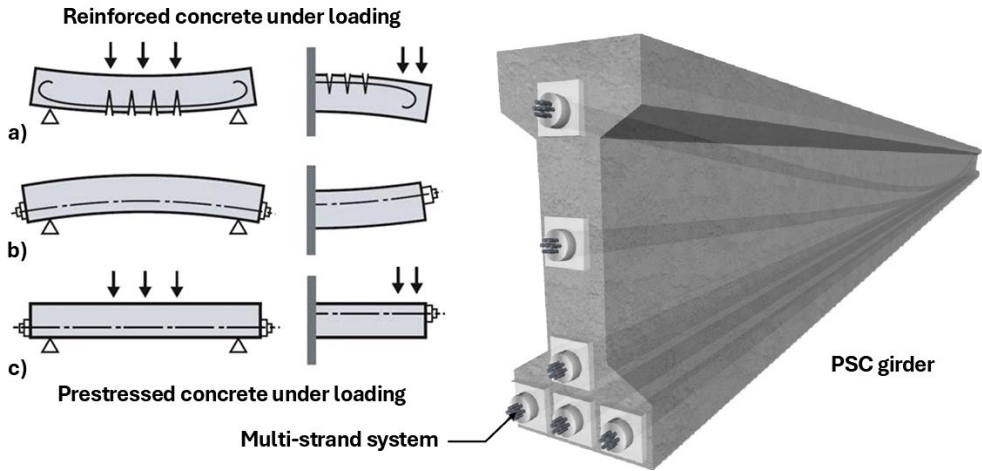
Prestressed concrete (PC) basic principles, a) reinforced concrete cracked under load; b) post-tensioned concrete before loading; c) post-tensioned concrete after loading.
